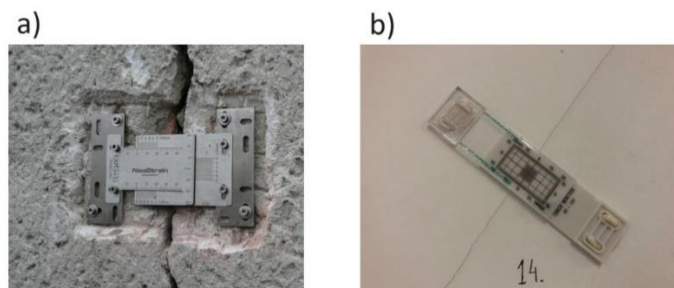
View of the installed crackmeters: a) inside the facility, b) outside the facility
